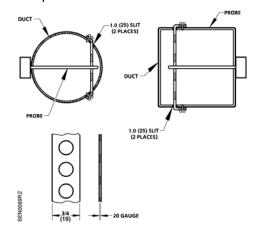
Steel Hanger Used to Support Sensor Probe Tip.
